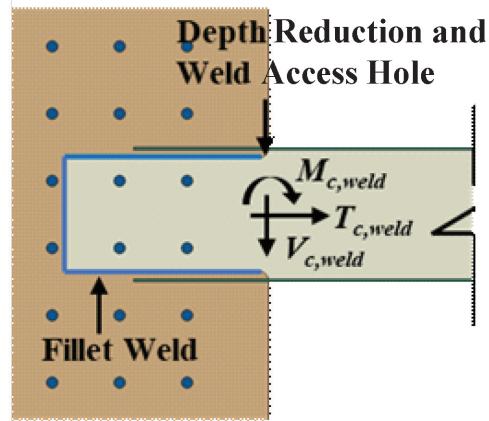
C-shaped fillet weld connecting beam web-to-wall web.
